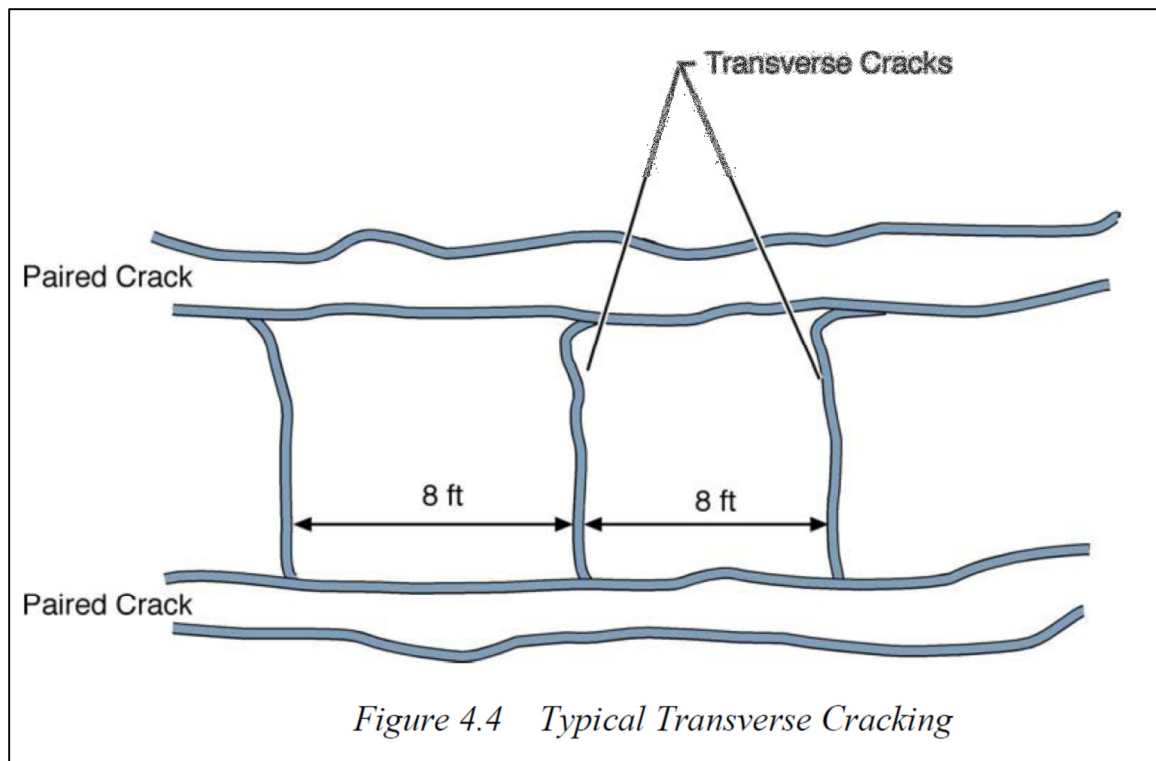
Typical transverse cracking on Dow Barge Canal Bridge (Folliard, Smith, Sellers, Brown, & Breen, 2003)
